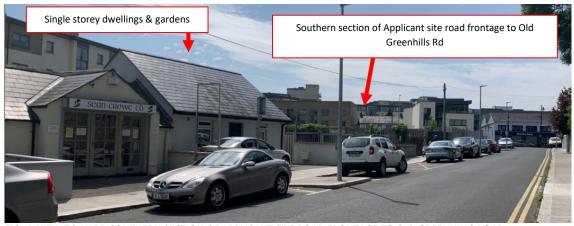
VIEW TOWARD SOUTHERN SECTION OF APPLICANT SITE ROAD FRONTAGE TO OLD GREENHILLS ROAD
